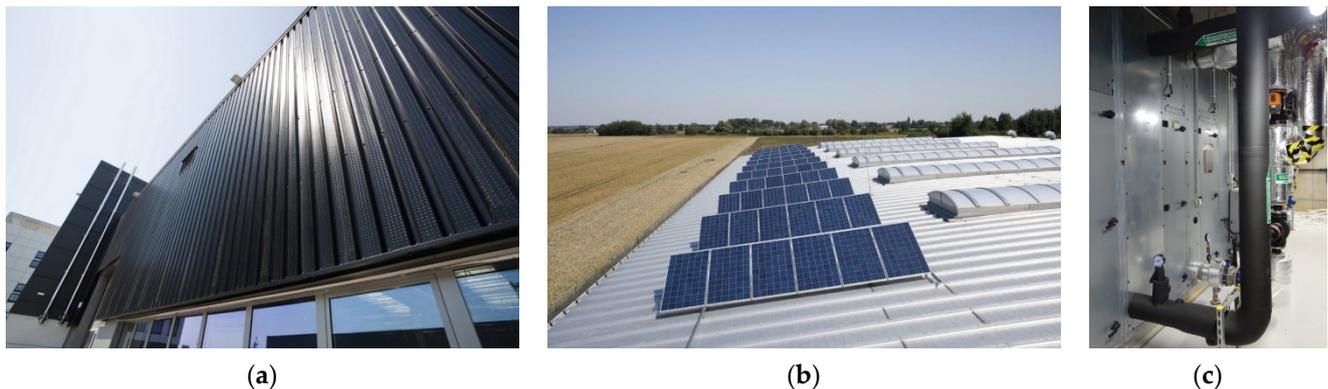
Solar wall that heats the assembly plant (a), a system of solar and photovoltaic panels on the roof (b) of building B-02, Smart Building Center–W.P.I.P. reprinted with permission from ref. [72] and the ventilation room (c) of building B-05 Nowy Targ [photographs taken by Kirschke, P.].
